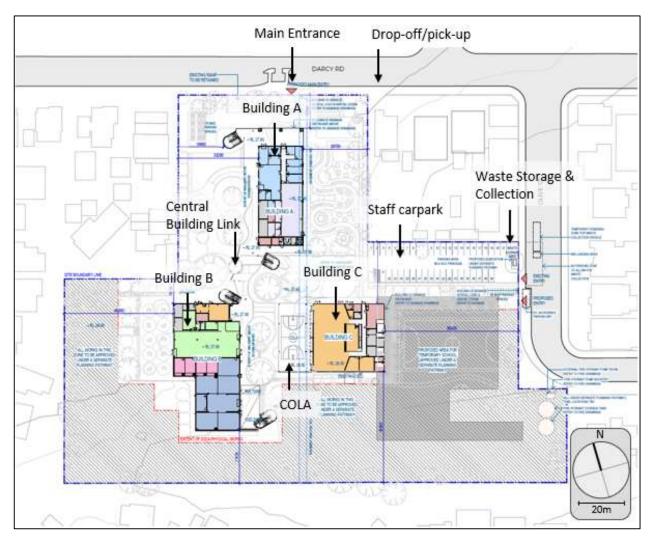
| Site layout (Base source: Applicant's EIS 2023)
